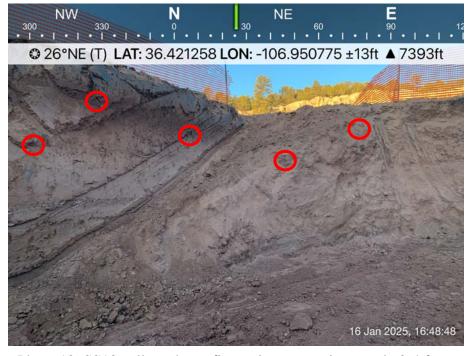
SS13 collected as a five-point composite sample 0-4 ft bgs from northeast sidewall of excavation.
